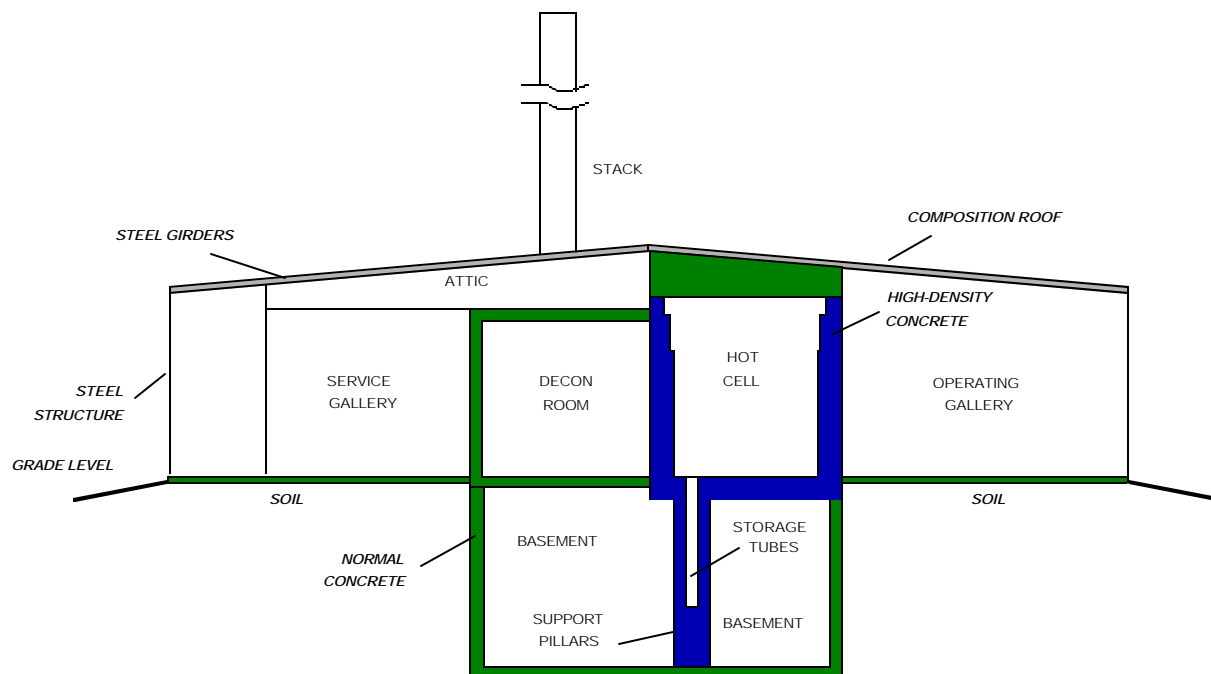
Elevation View of Building 4020, Showing the Geometry of the Hot Cells, Decon Rooms, and Basement.
